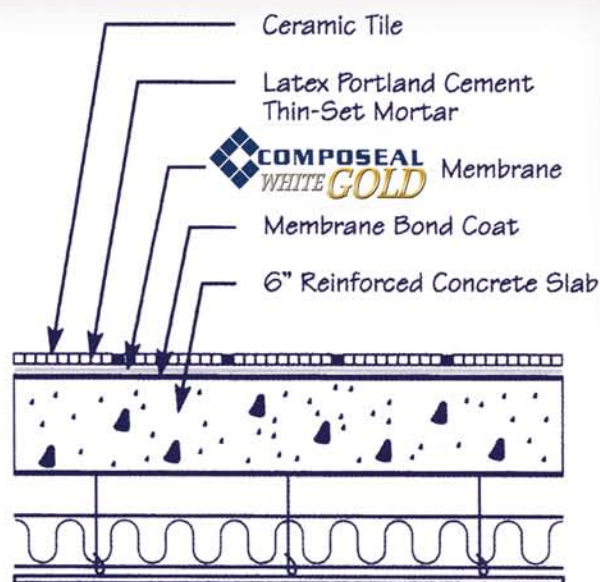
COMPOSEAL WHITE GOLD in thin-set tile installation over 6" reinforced concrete slab above suspended ceiling.
